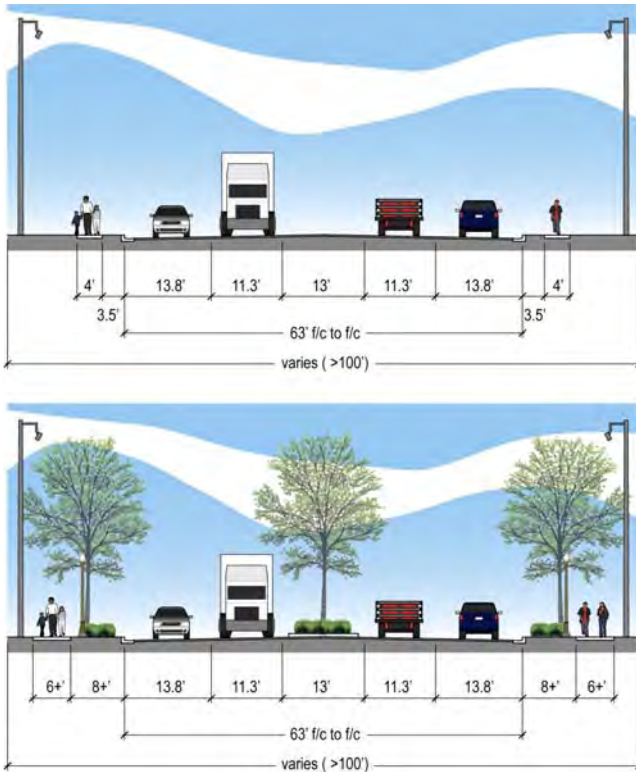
Existing and proposed cross-sections of Bay Bridge Road revealing how the corridor could be made more attractive and pedestrian-friendly through sidewalk improvements, landscaping and pedestrian-scale lighting. Landscaped median would be located between center turn lanes where possible. Trees within the right-of-way must meet ALDOT standards.
